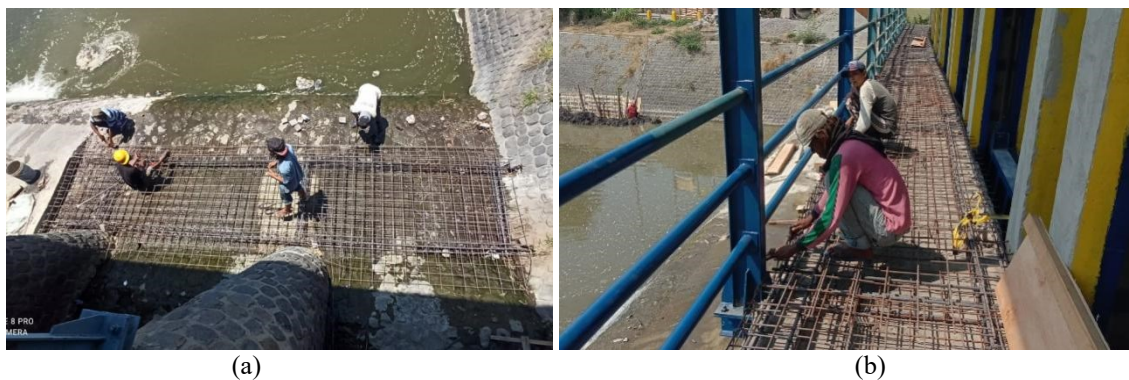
(a) construction of downstream floor strengthening and (b) beam strengthening
